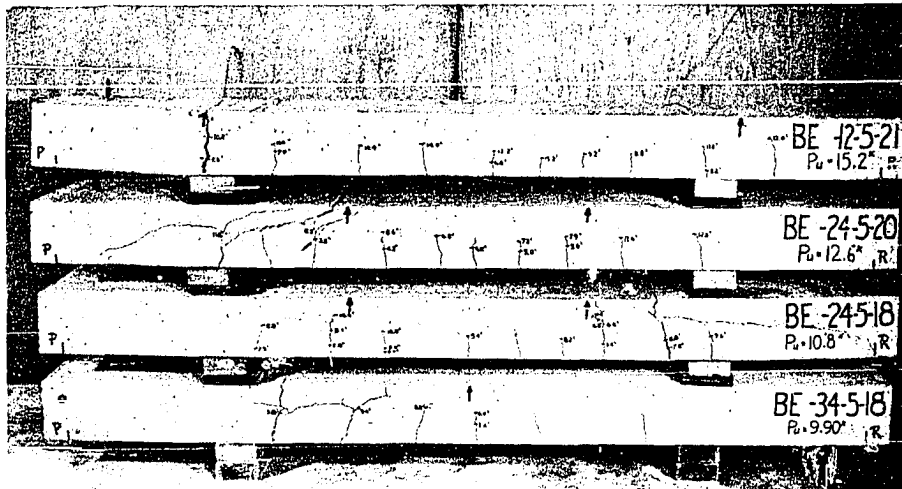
Typical shear-bond failures of beams constructed with deck E-20 gage. Each beam was 12 inches wide and 6 feet in length
